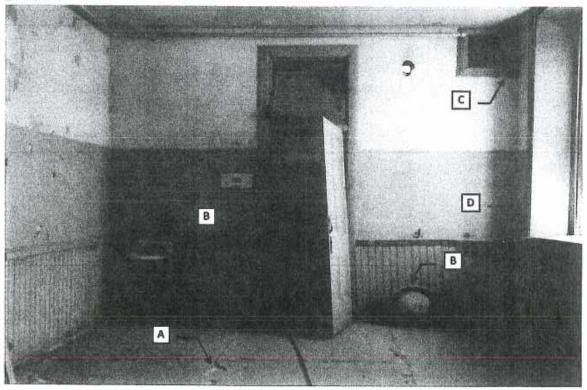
Girls' Bathroom view east. (A) Disintegrating concrete, (B) Historic porcelain sink, (C) Upper fresh air gravity vent intersecting south wall vent, (D) Wall is buckling inward. 36
